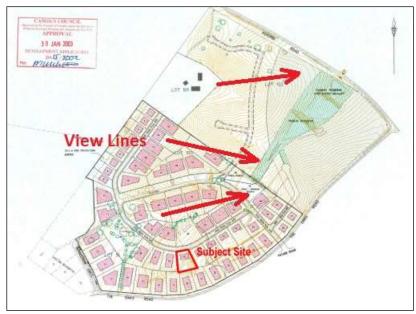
Approved subdivision plan illustrating overlayed view corridors
